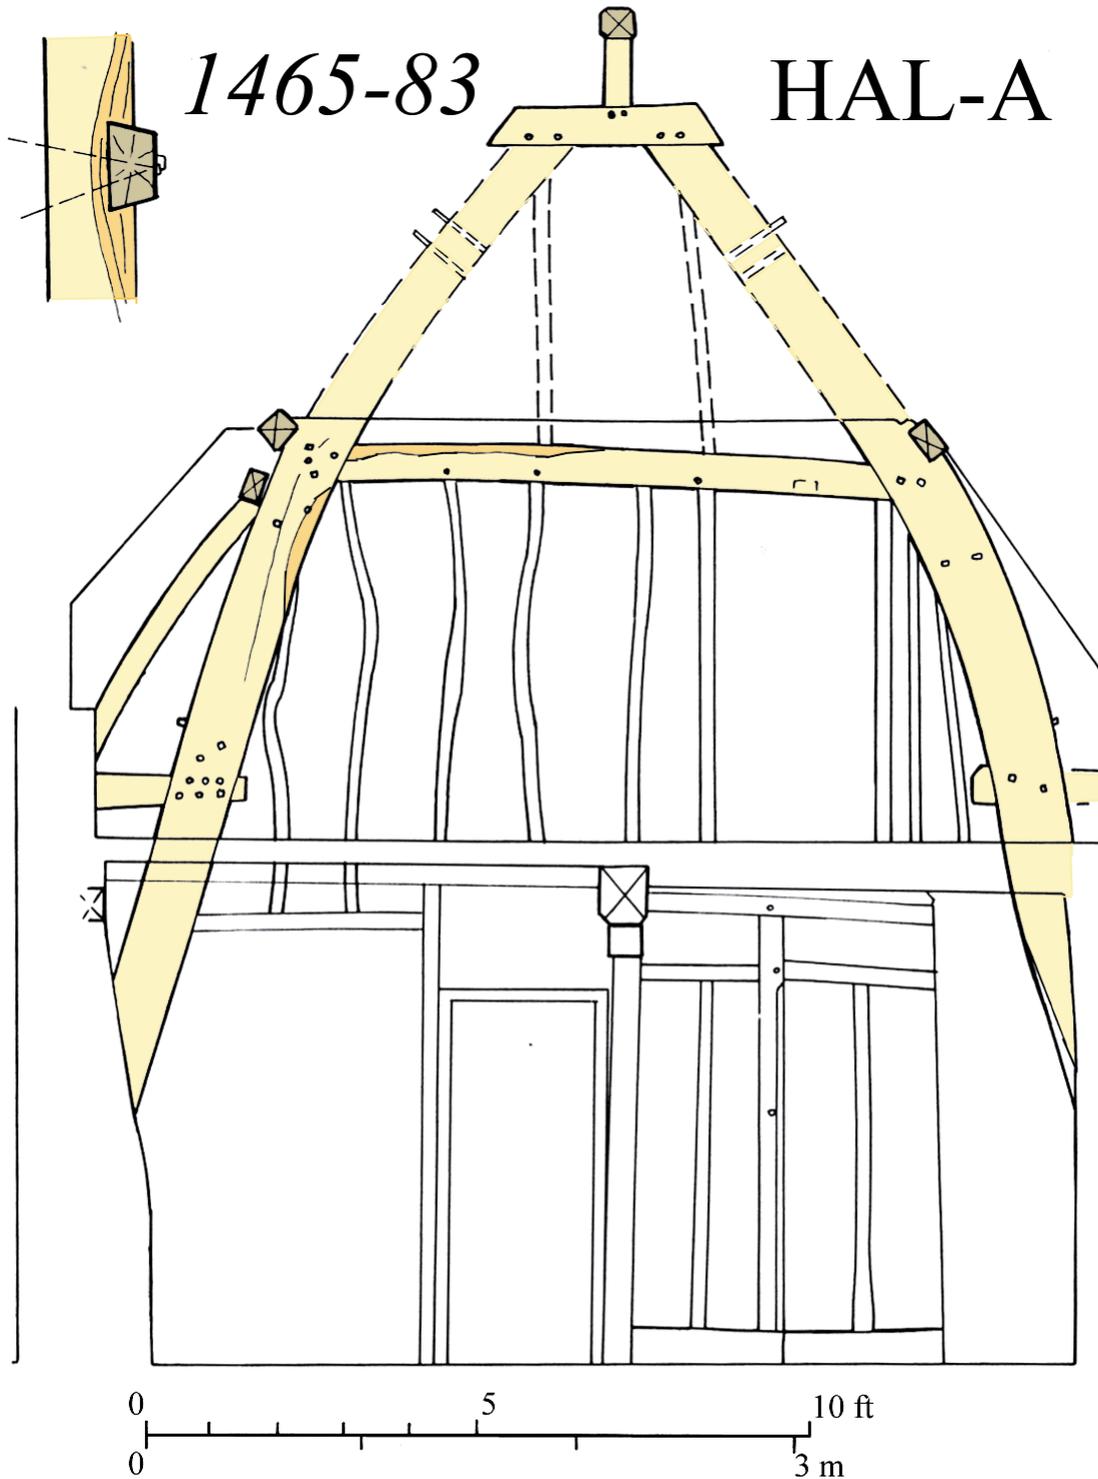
Section of truss T2 from east. Inset: face view of cruck spur dovetail.
